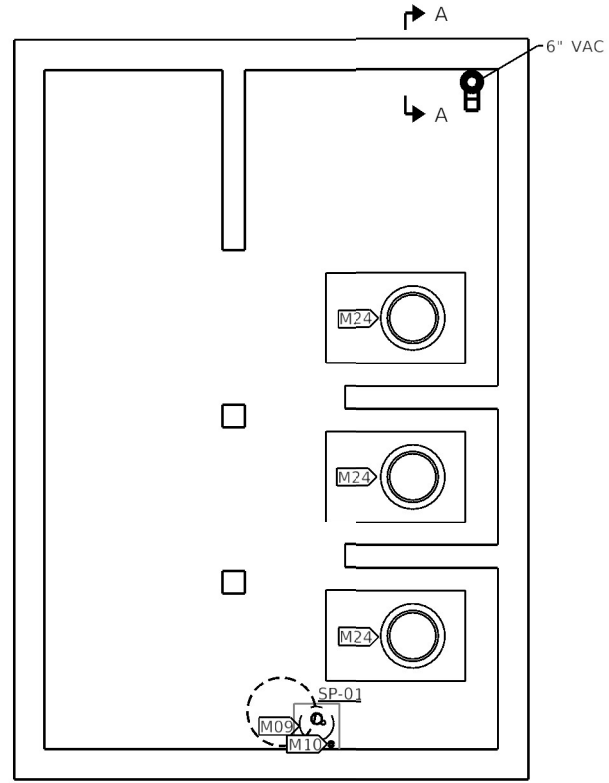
RESTROOM BELOW FLOOR SANITARY PIPING PLAN
